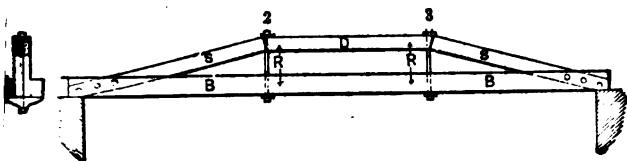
Trussed Wooden Girder. Two Vertical Ties
